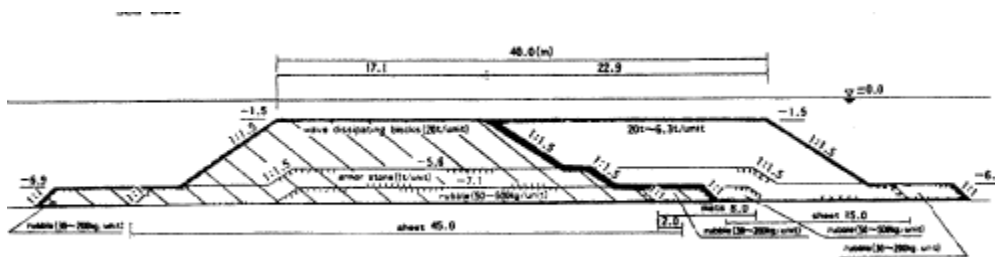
Typical cross section of SBW (Pilarczyk, 2003)
